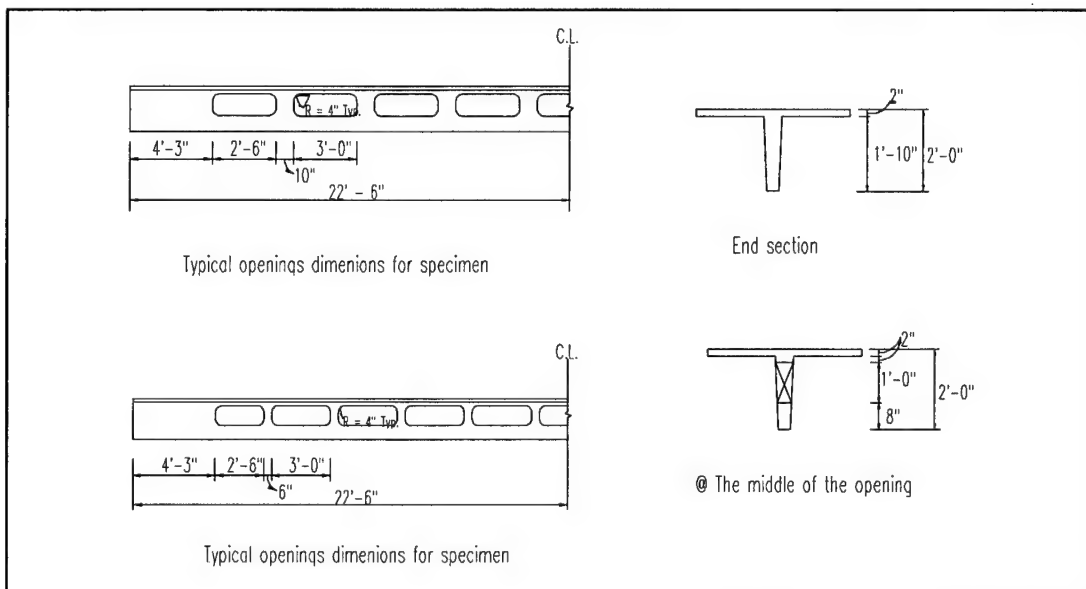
Web opening locations and sizes for straight strand profile specimens.
